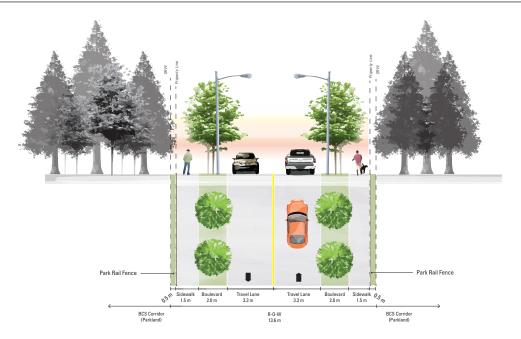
Local BCS Road Crossing 13.6 m Cross-section
